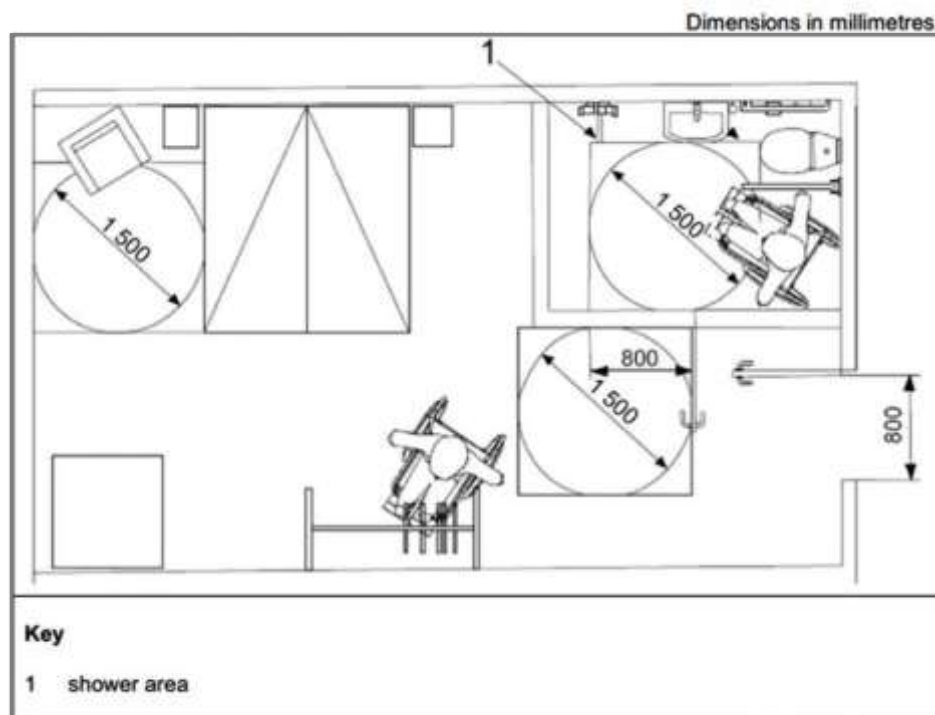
Example of space allowances for accessible bedroom dan bathroom
